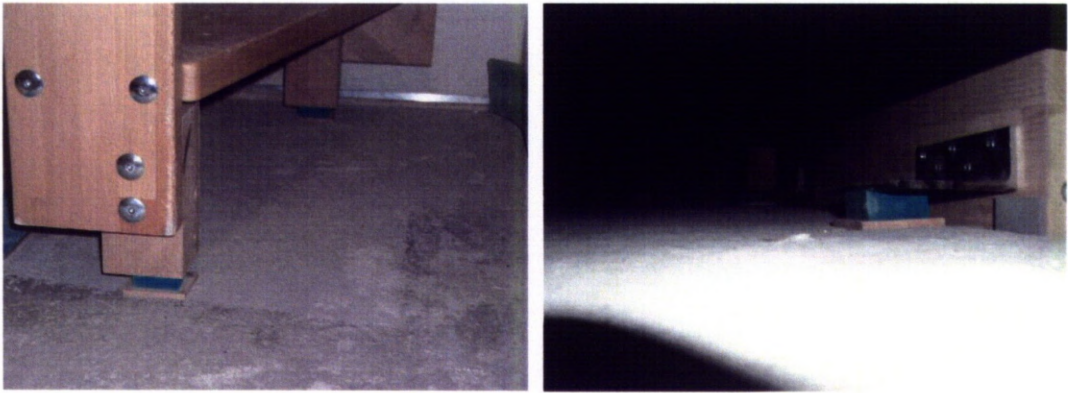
Stair supported on floor and ceiling: Main set-up with resilient layers
